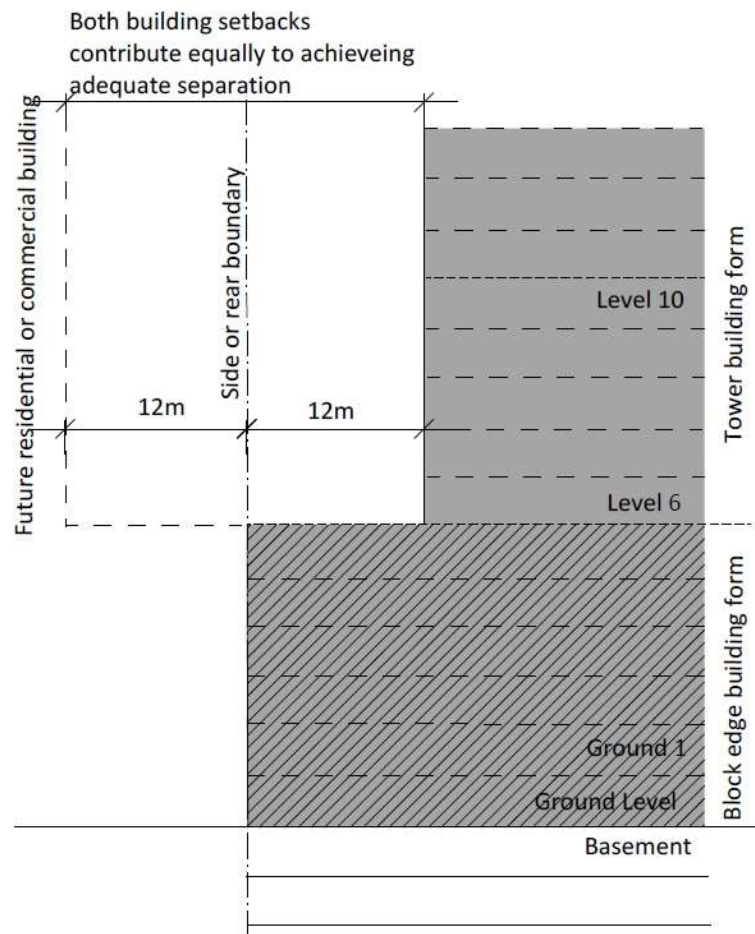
Elevation - Side and rear boundary setbacks to prevent overlooking
